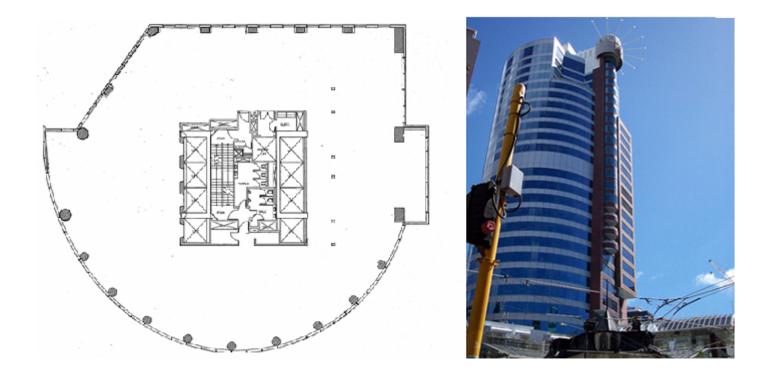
CYCLE TWO, BUILDING M4 – WELLINGTON 1 – 26 STOREY OFFICE BUILDING – TYPICAL FLOOR PLAN AND ELEVATION
